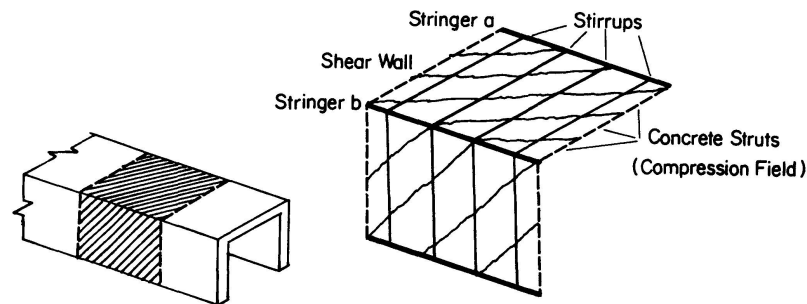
Shear Walls of a Thin-Walled Reinforced Concrete Beam.
